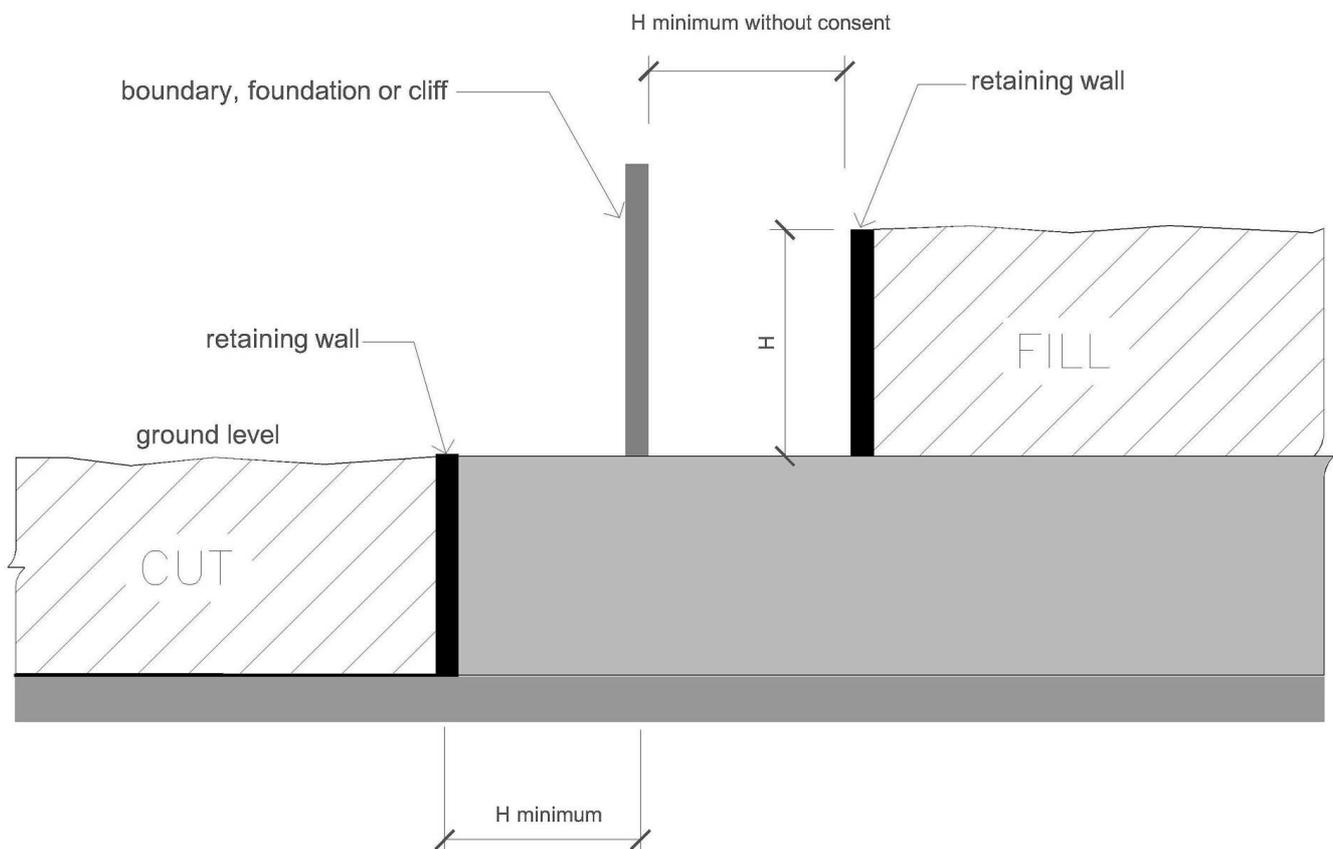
B Cut and fill supported by retaining walls (elevation view)
